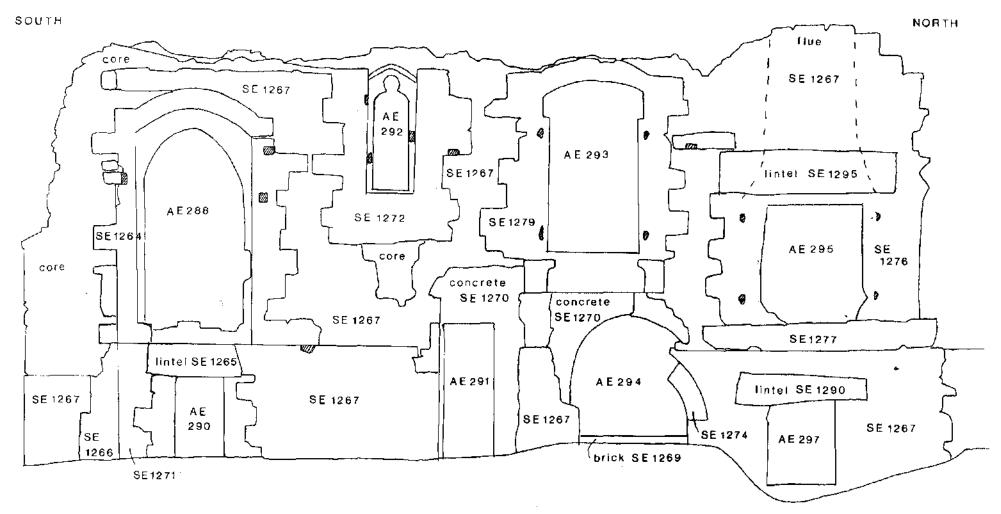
The Frater; West Wall, East Interior Elevation. (Sterenberg et al.)
